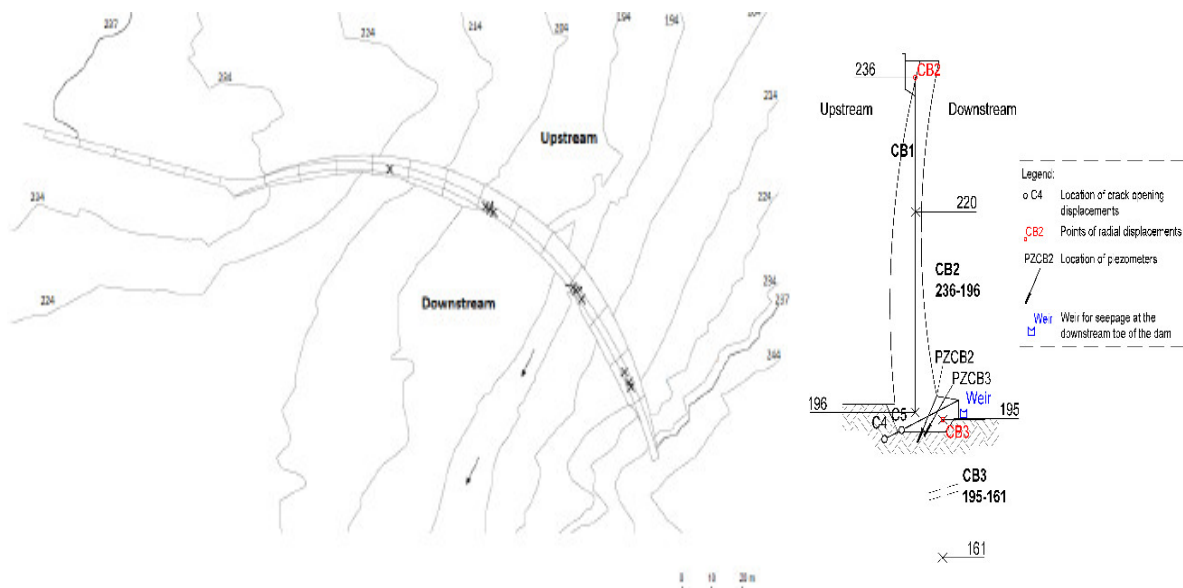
Layout of the dam (left) and central block section with monitoring instruments (right).
